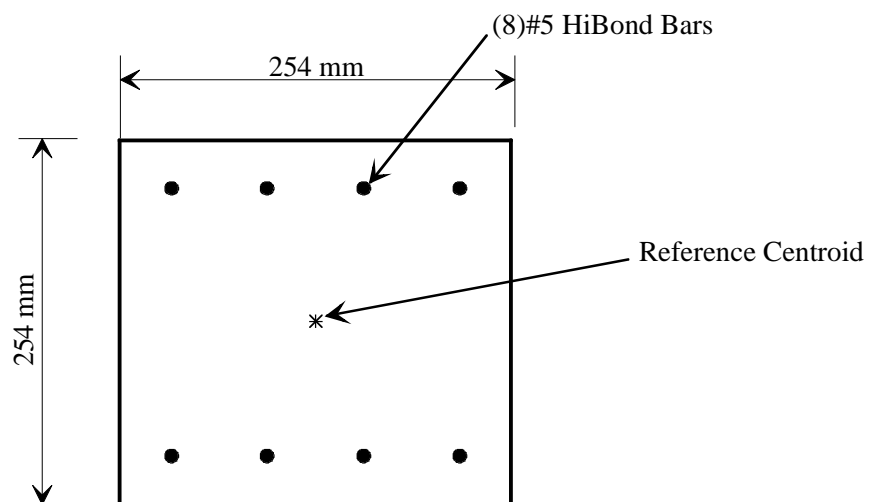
Typical column specimen - Hognestad (1951, Group II)
